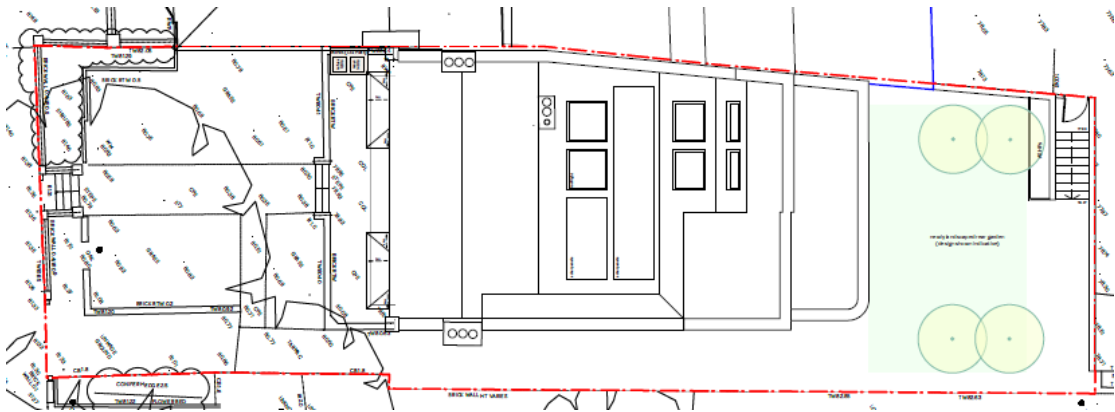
Proposed site plan (2408\_L\_042) with proposed works areas demarcated within the redline boundary.
